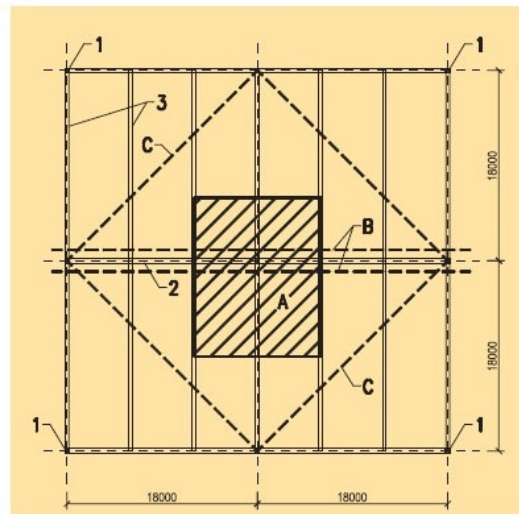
Maximum loading of roof structure: (A) Air-conditioning unit of 20t, (B) Line loading of piping and wiring, (C) The other technology service load per square unit, (1) Columns, (2) Main beams, (3) Girders
